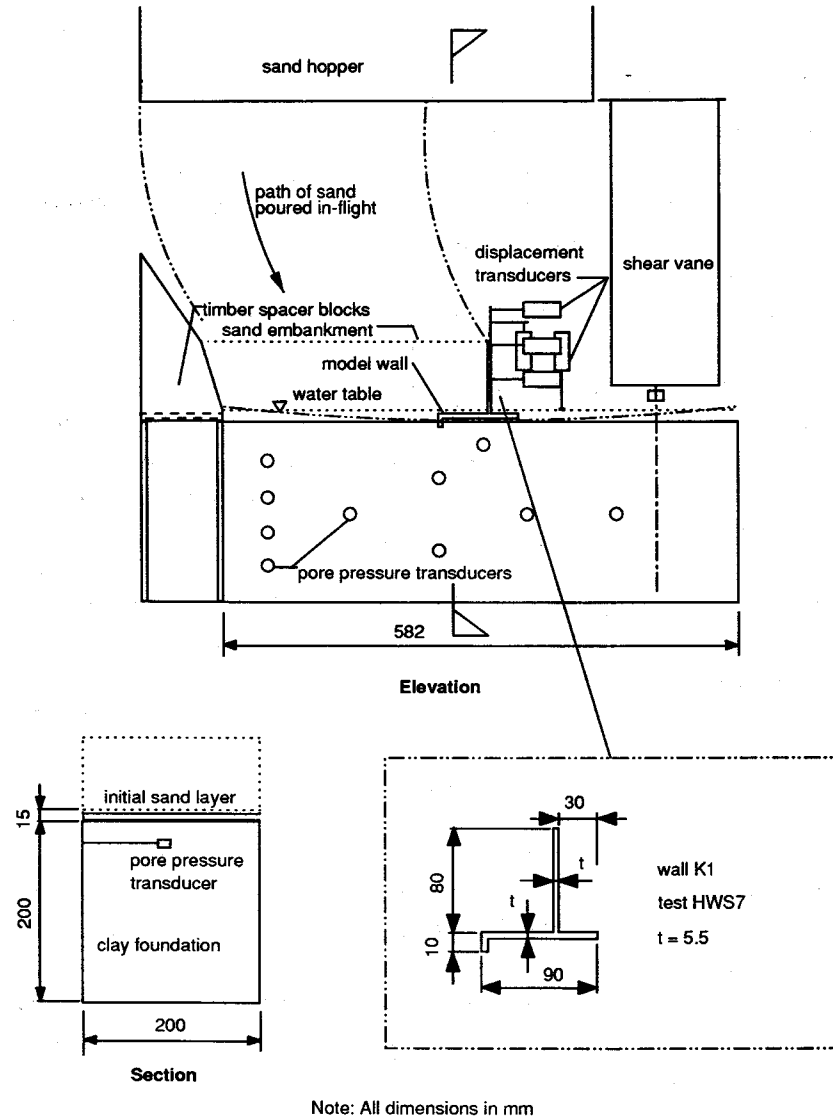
Typical arrangement of centrifuge model (test HWS7)
